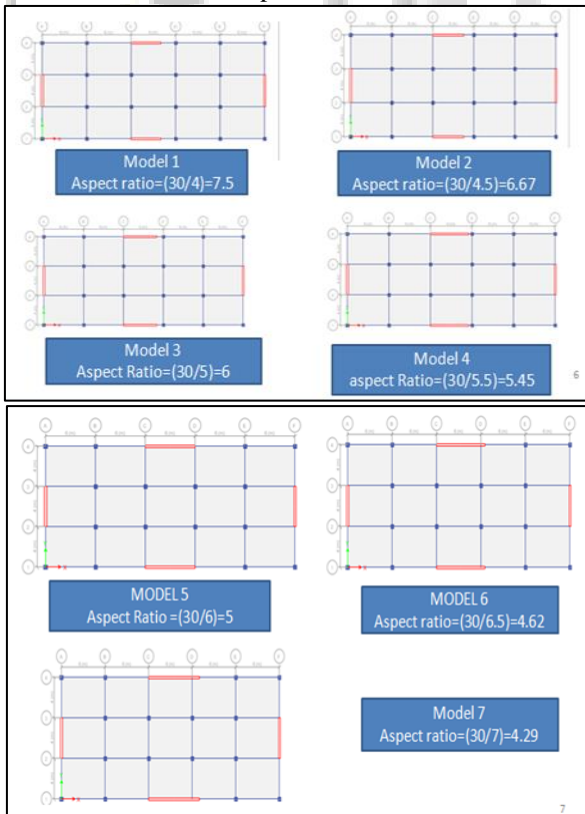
Plan of Building Models with shear wall based on Aspect ratio
